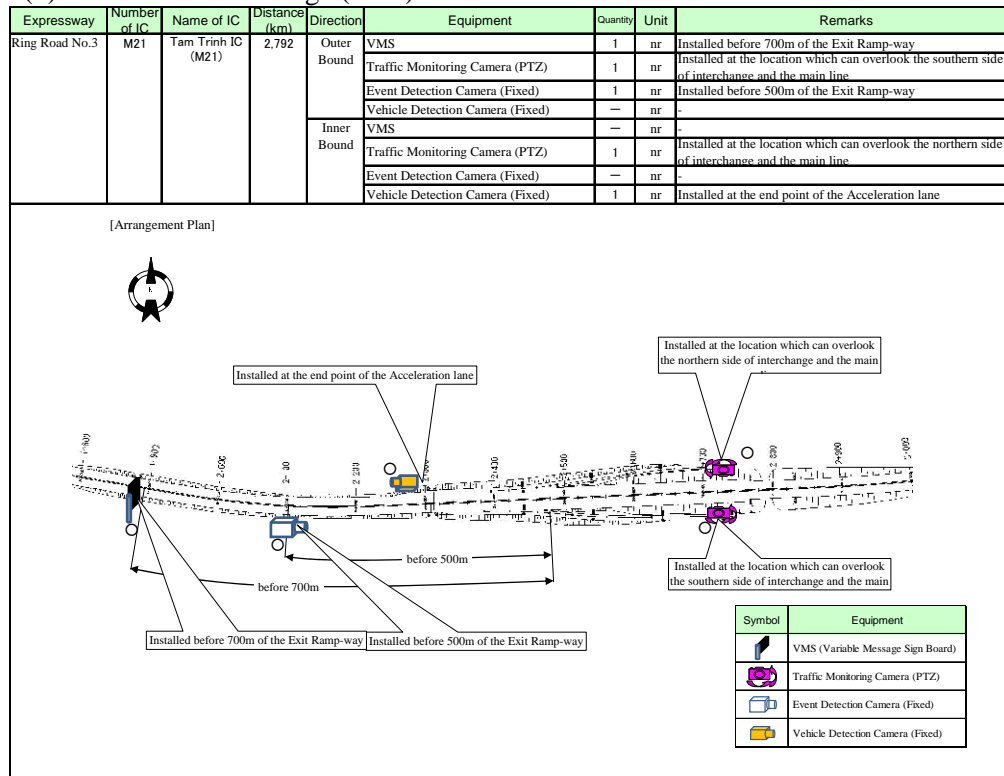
Equipment Layout Plan at Tam Trinh Interchange (M21)
